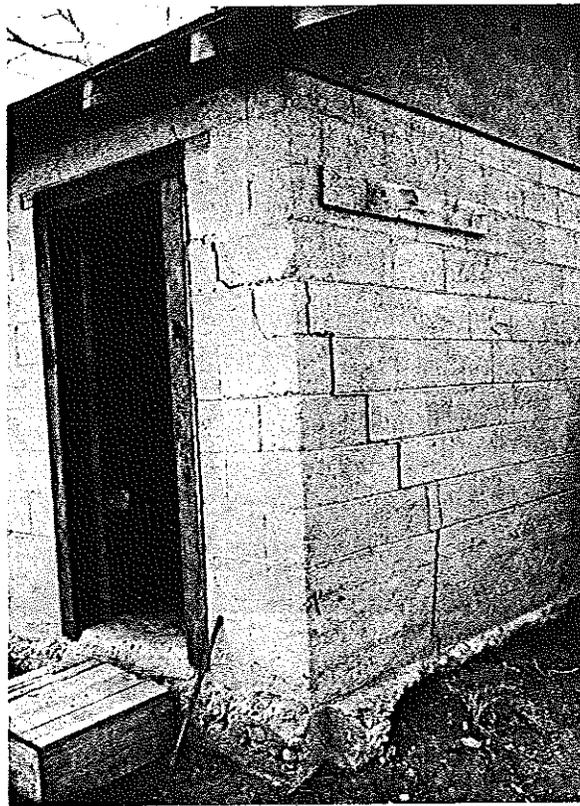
STAIRSTEP CRACKING OF MORTARED JOINTS IN CINDER BLOCK WALLS.
